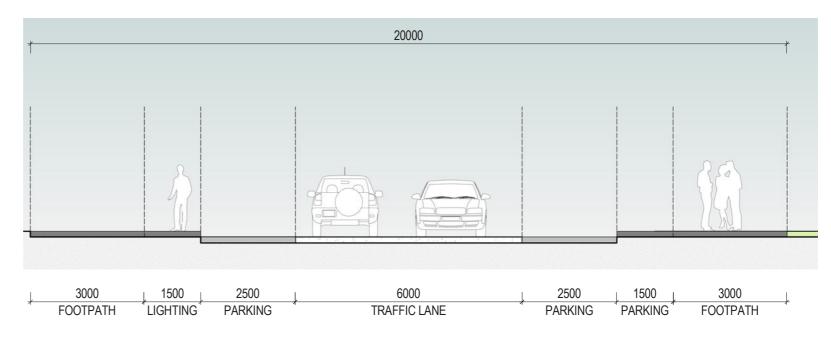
20m Wide Streets - Typical Section (Source: Ryde DCP 2014)
